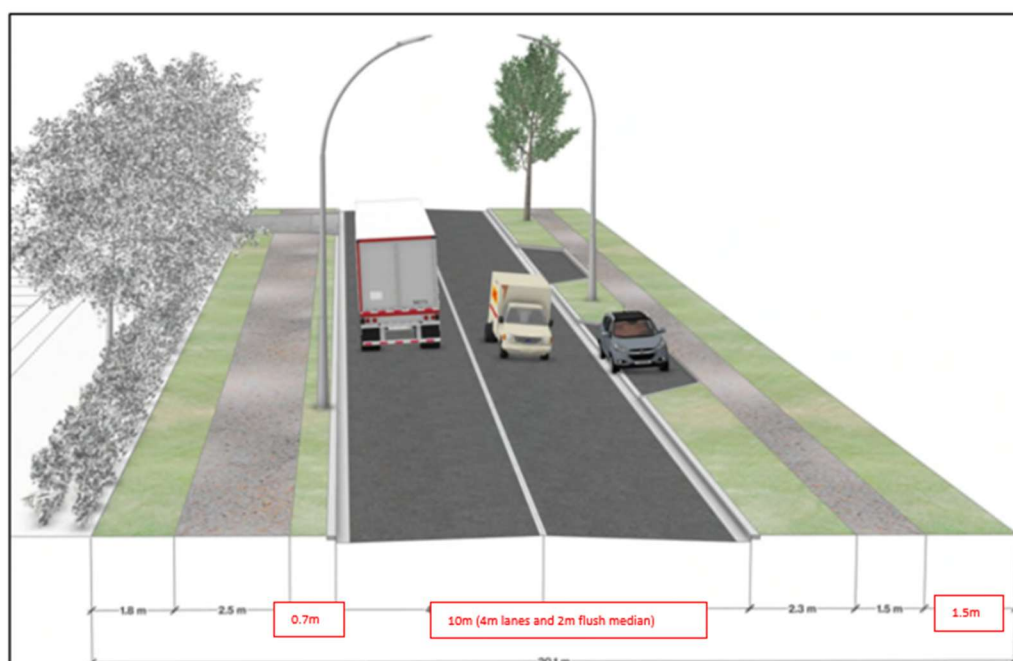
e (Indicative Old Ruffell Road cross section (Collector))
